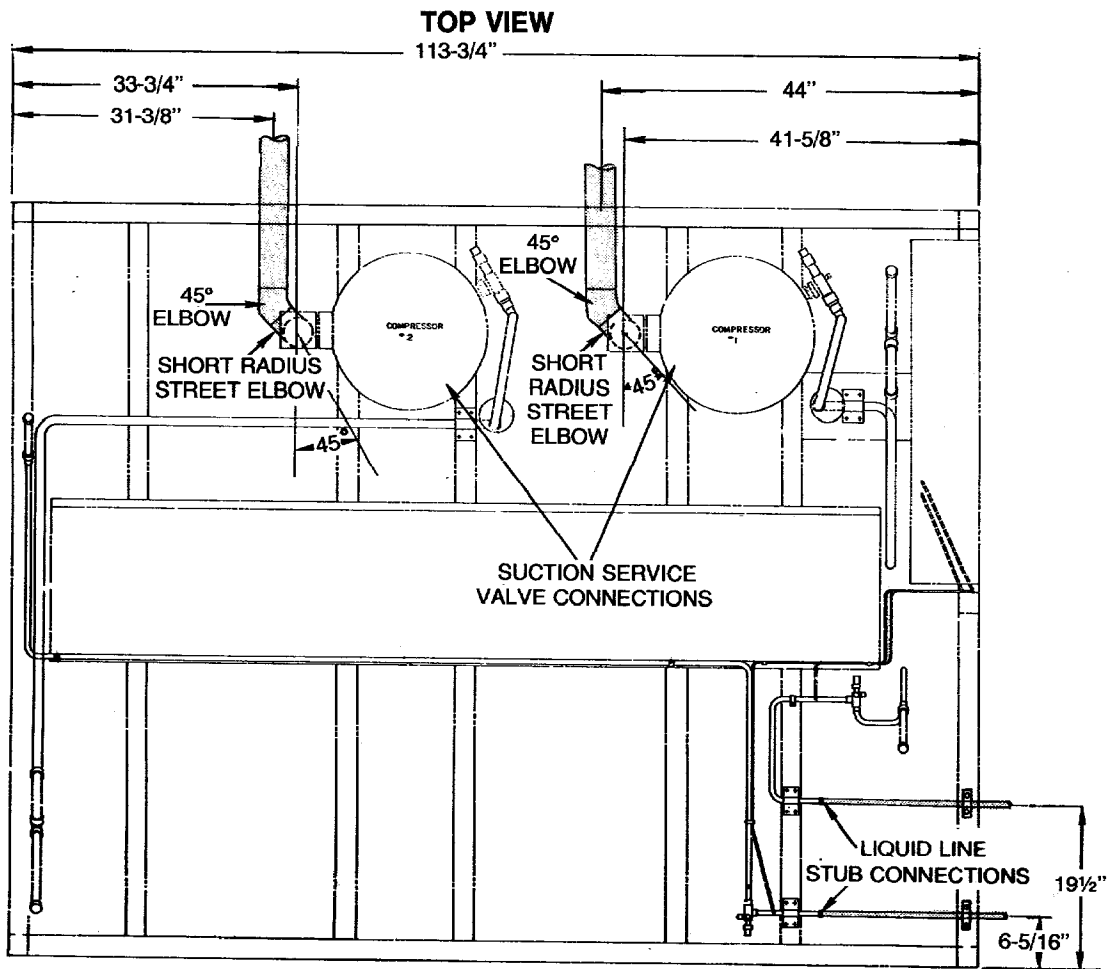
Piping Installation: 50 and 60-Ton Units Without Isolators
